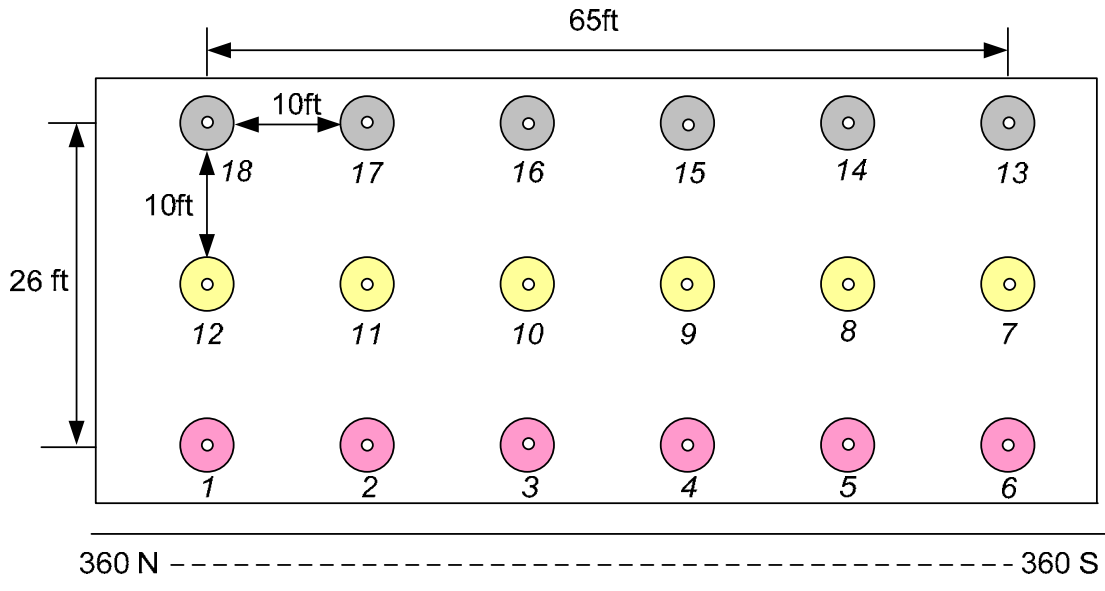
Layout of 18 non-production drilled shaft holes
